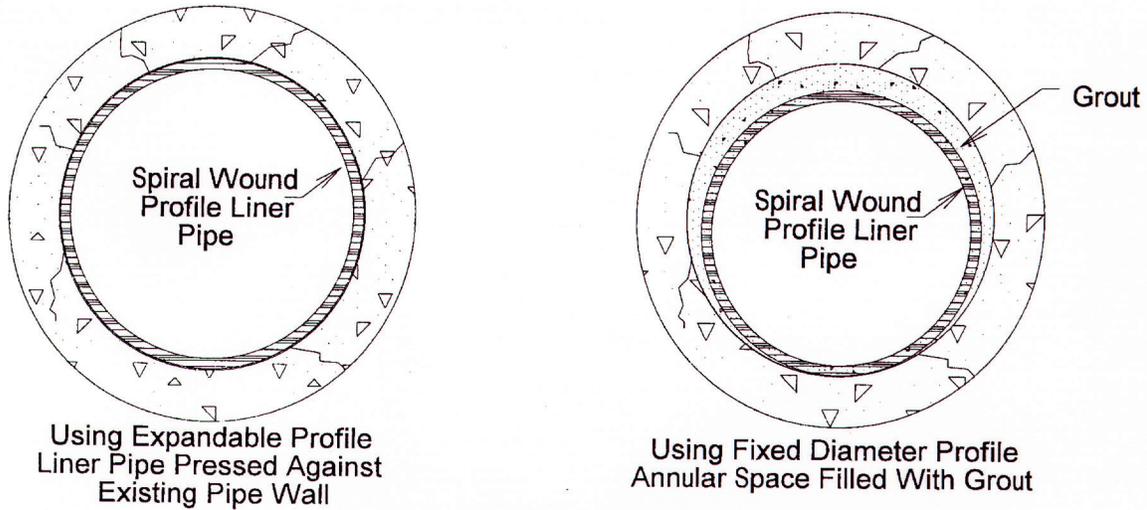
Drawings. Inserted Expandable and Fixed Diameter Spirally Wound Lining.⁽⁶⁴⁾
